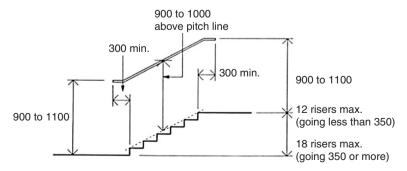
Handrails to external stepped and ramped access - key dimensions (mm)
